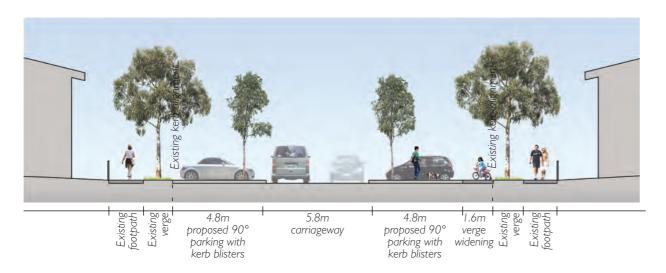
TYPICAL SECTION AT MID-BLOCK CROSSING, 1:100 @A3
